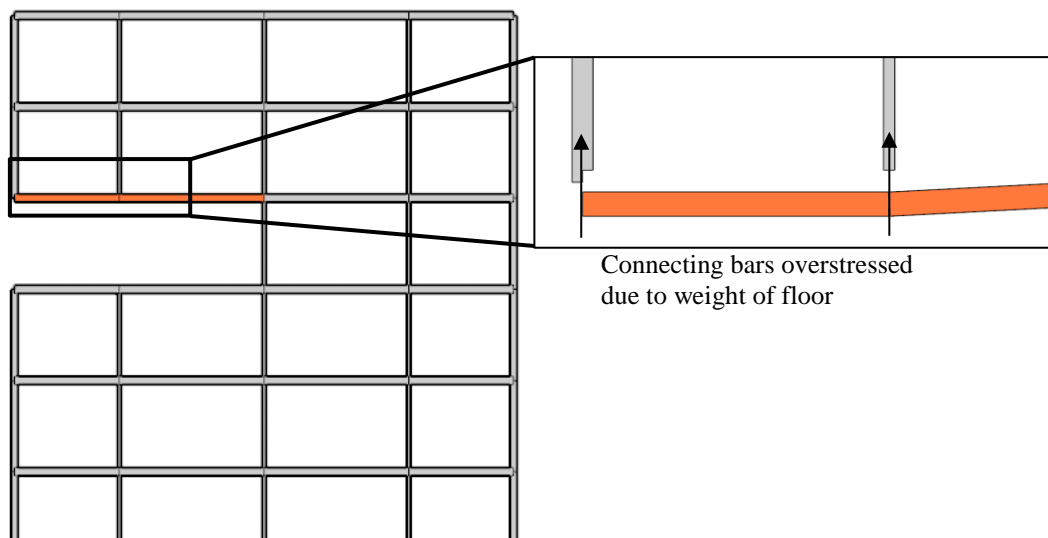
With the loss of the flank wall and the first internal wall, the floor on the level above the explosion will no longer have support from below and will try to vertically suspend from the wall above. The connecting steel reinforcement bar would become overstressed due to the weight of the floor, leading to the tensile failure of this connection.
